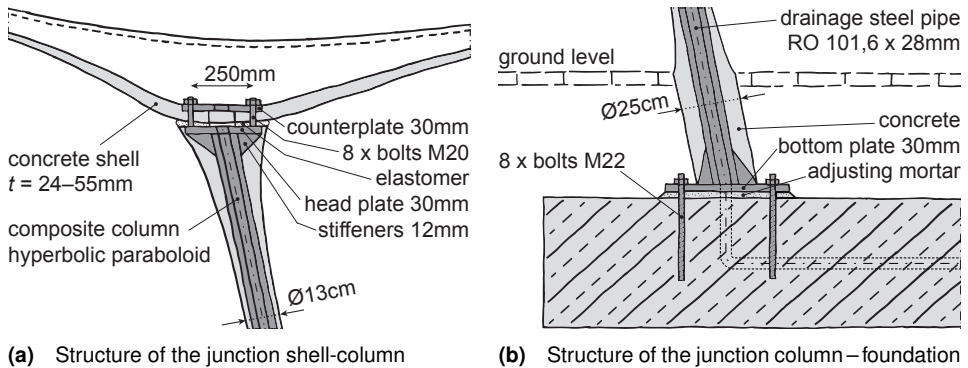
Construction details of the mounting joints of *Parapluie* as basis for the construction
